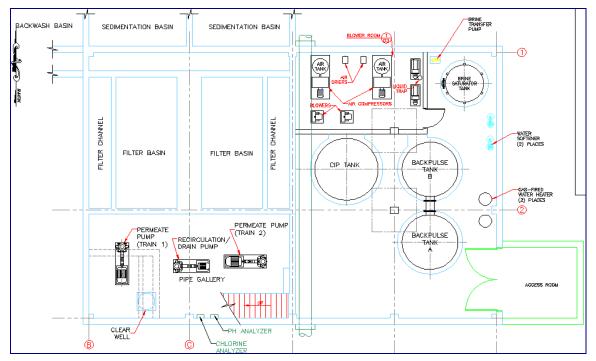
New Plant Layout – Proposed Membrane Installation
